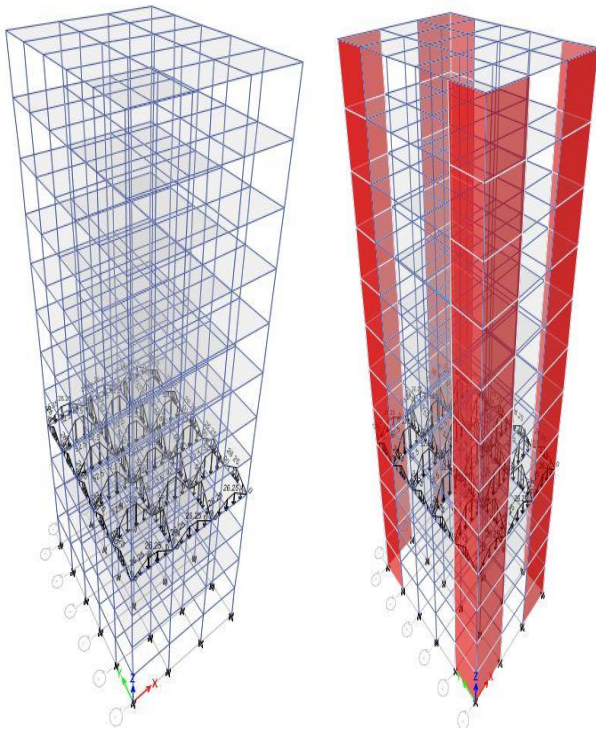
3d View Of Building With Heavy mass at 4th floor With And Without Shear Wall
